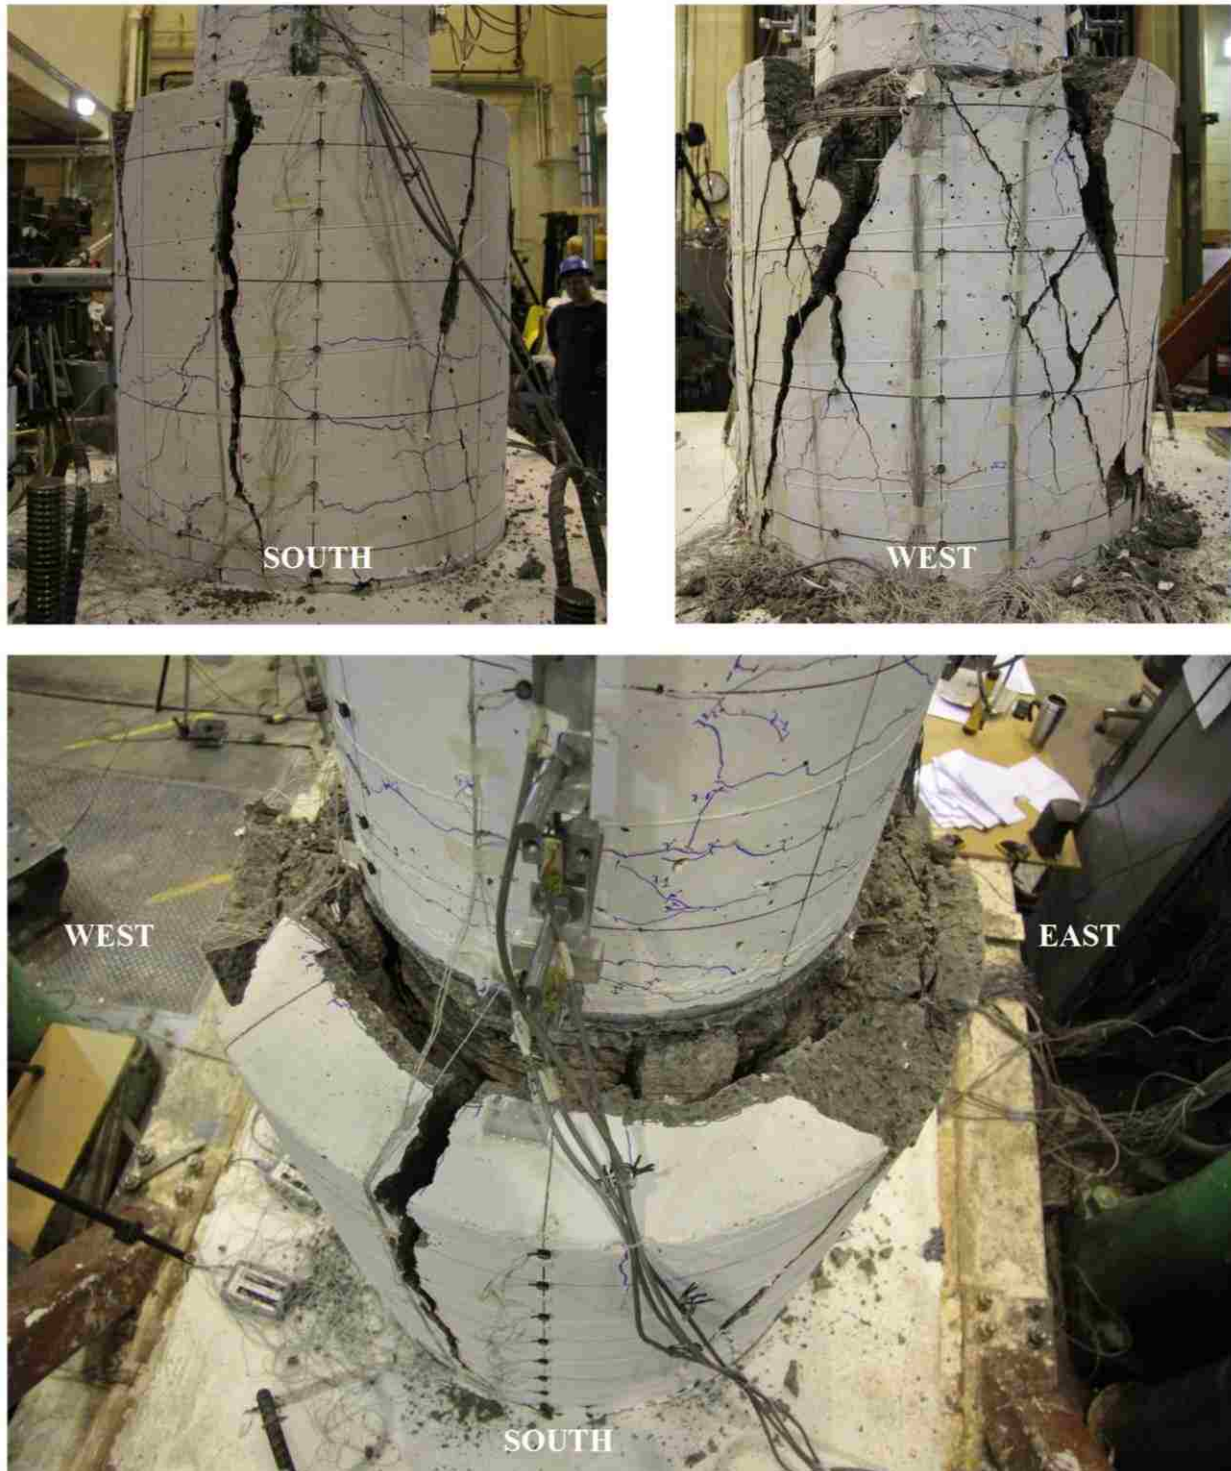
DS-2 – Shaft damage after cyclic testing
